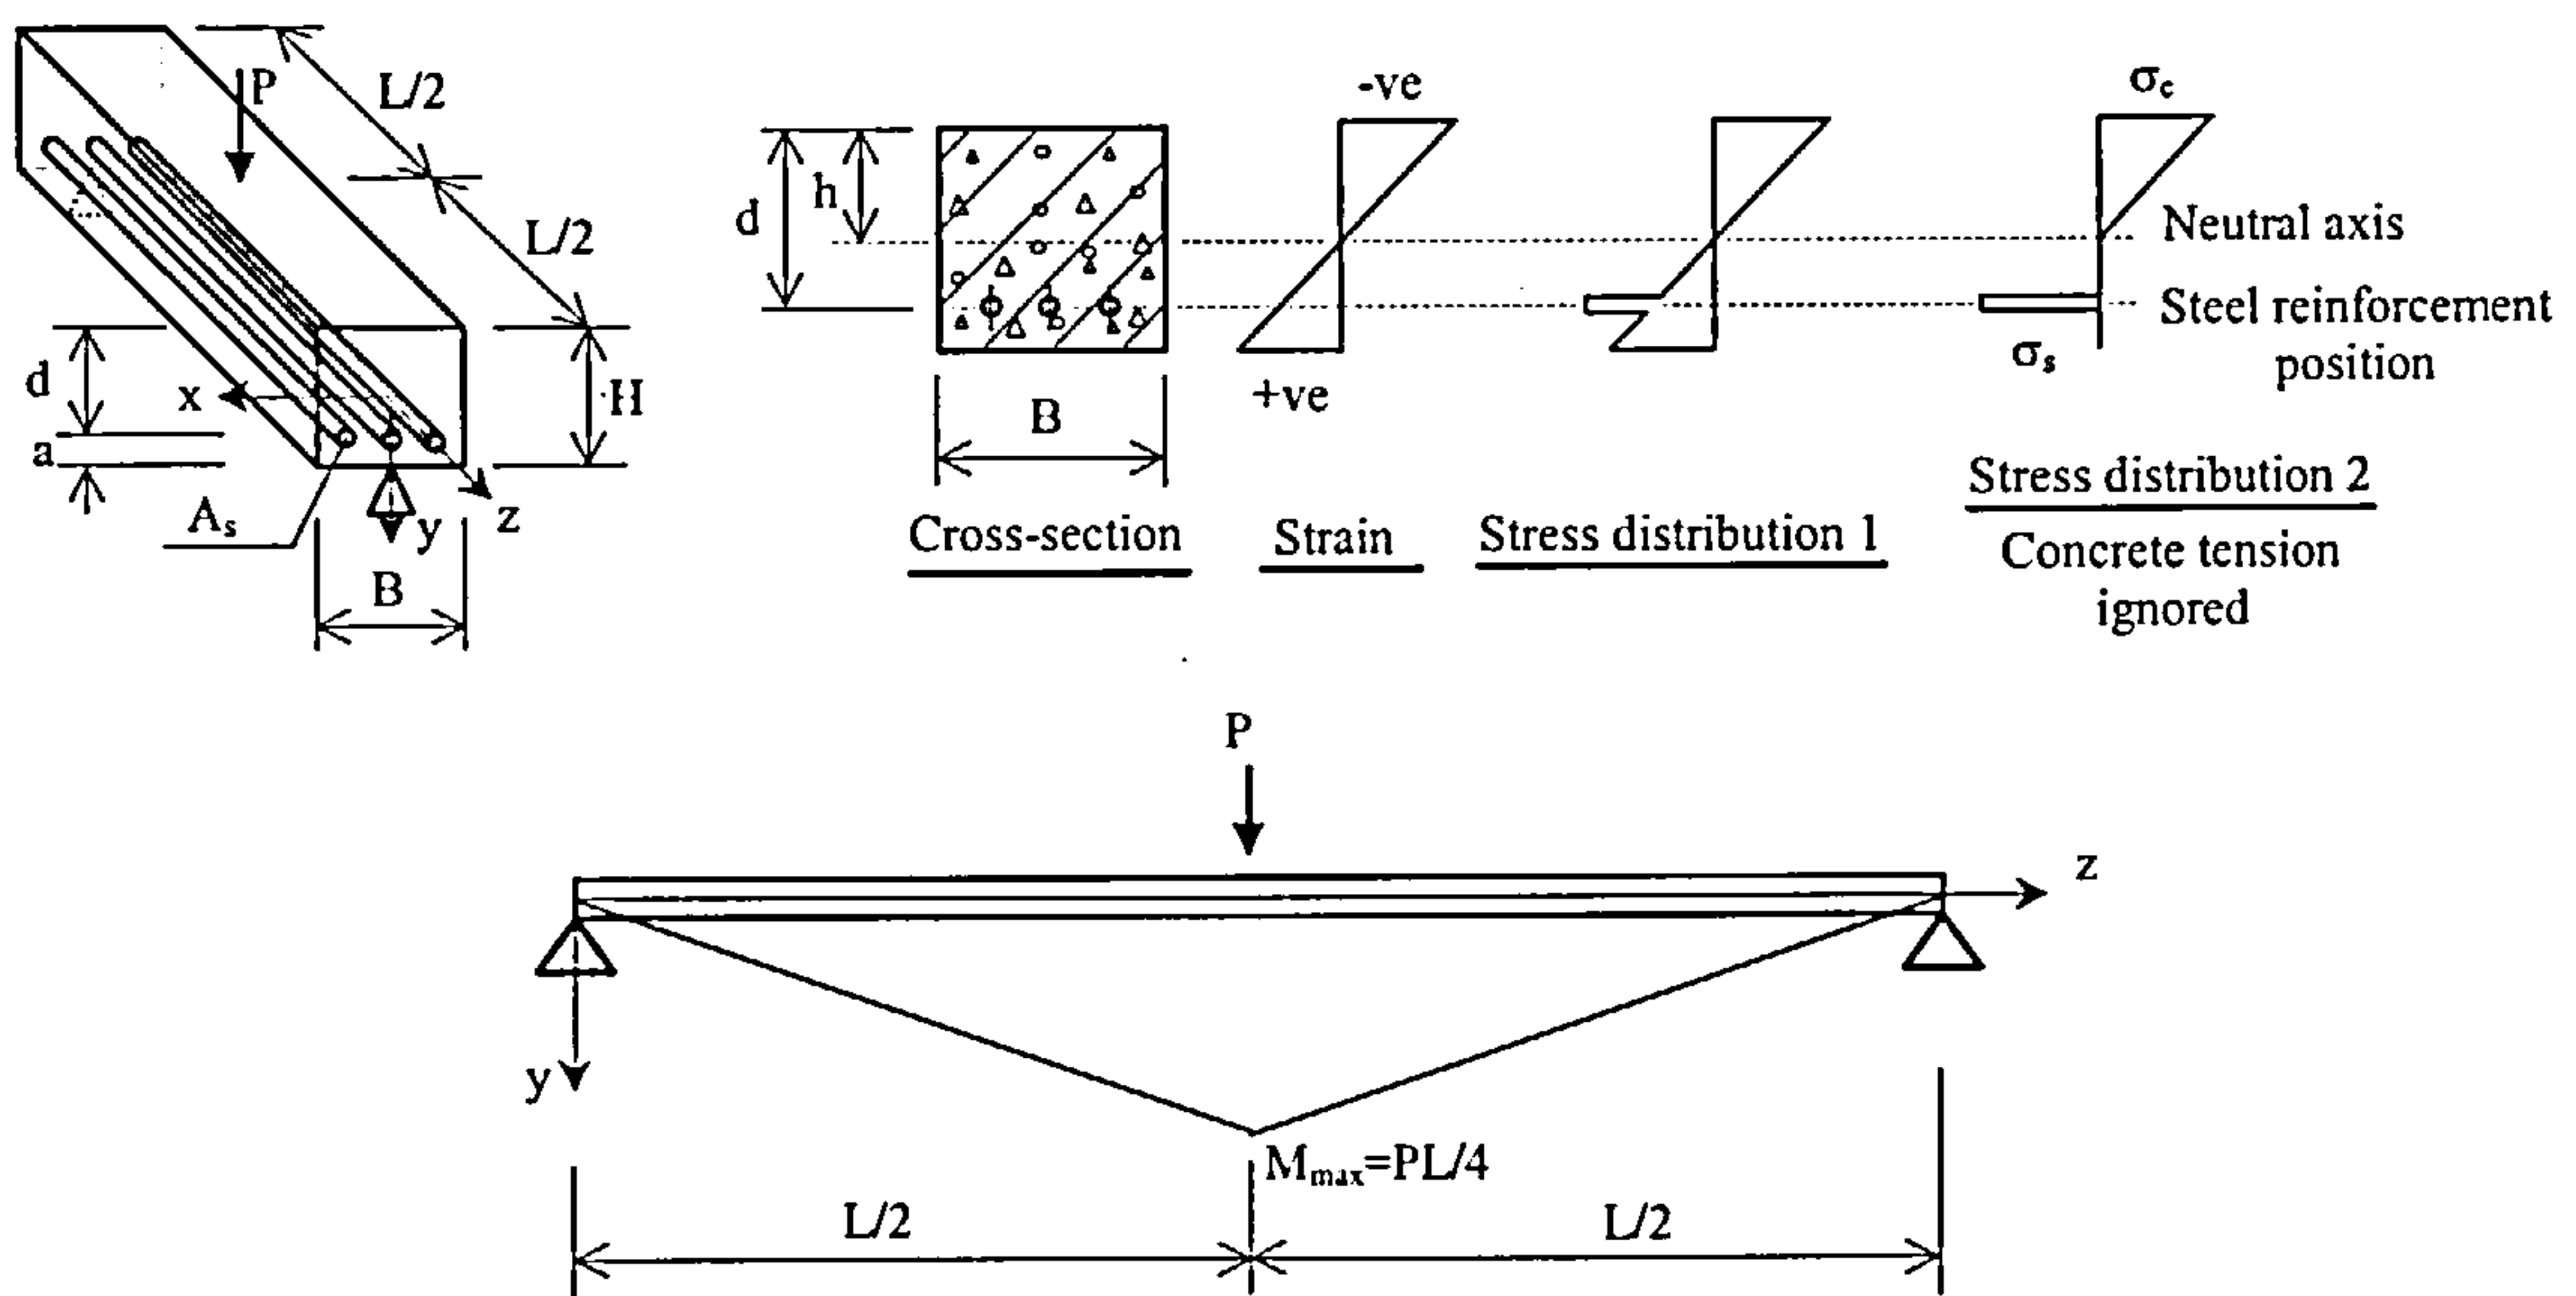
Simply supported reinforced concrete beam under a central point load P
